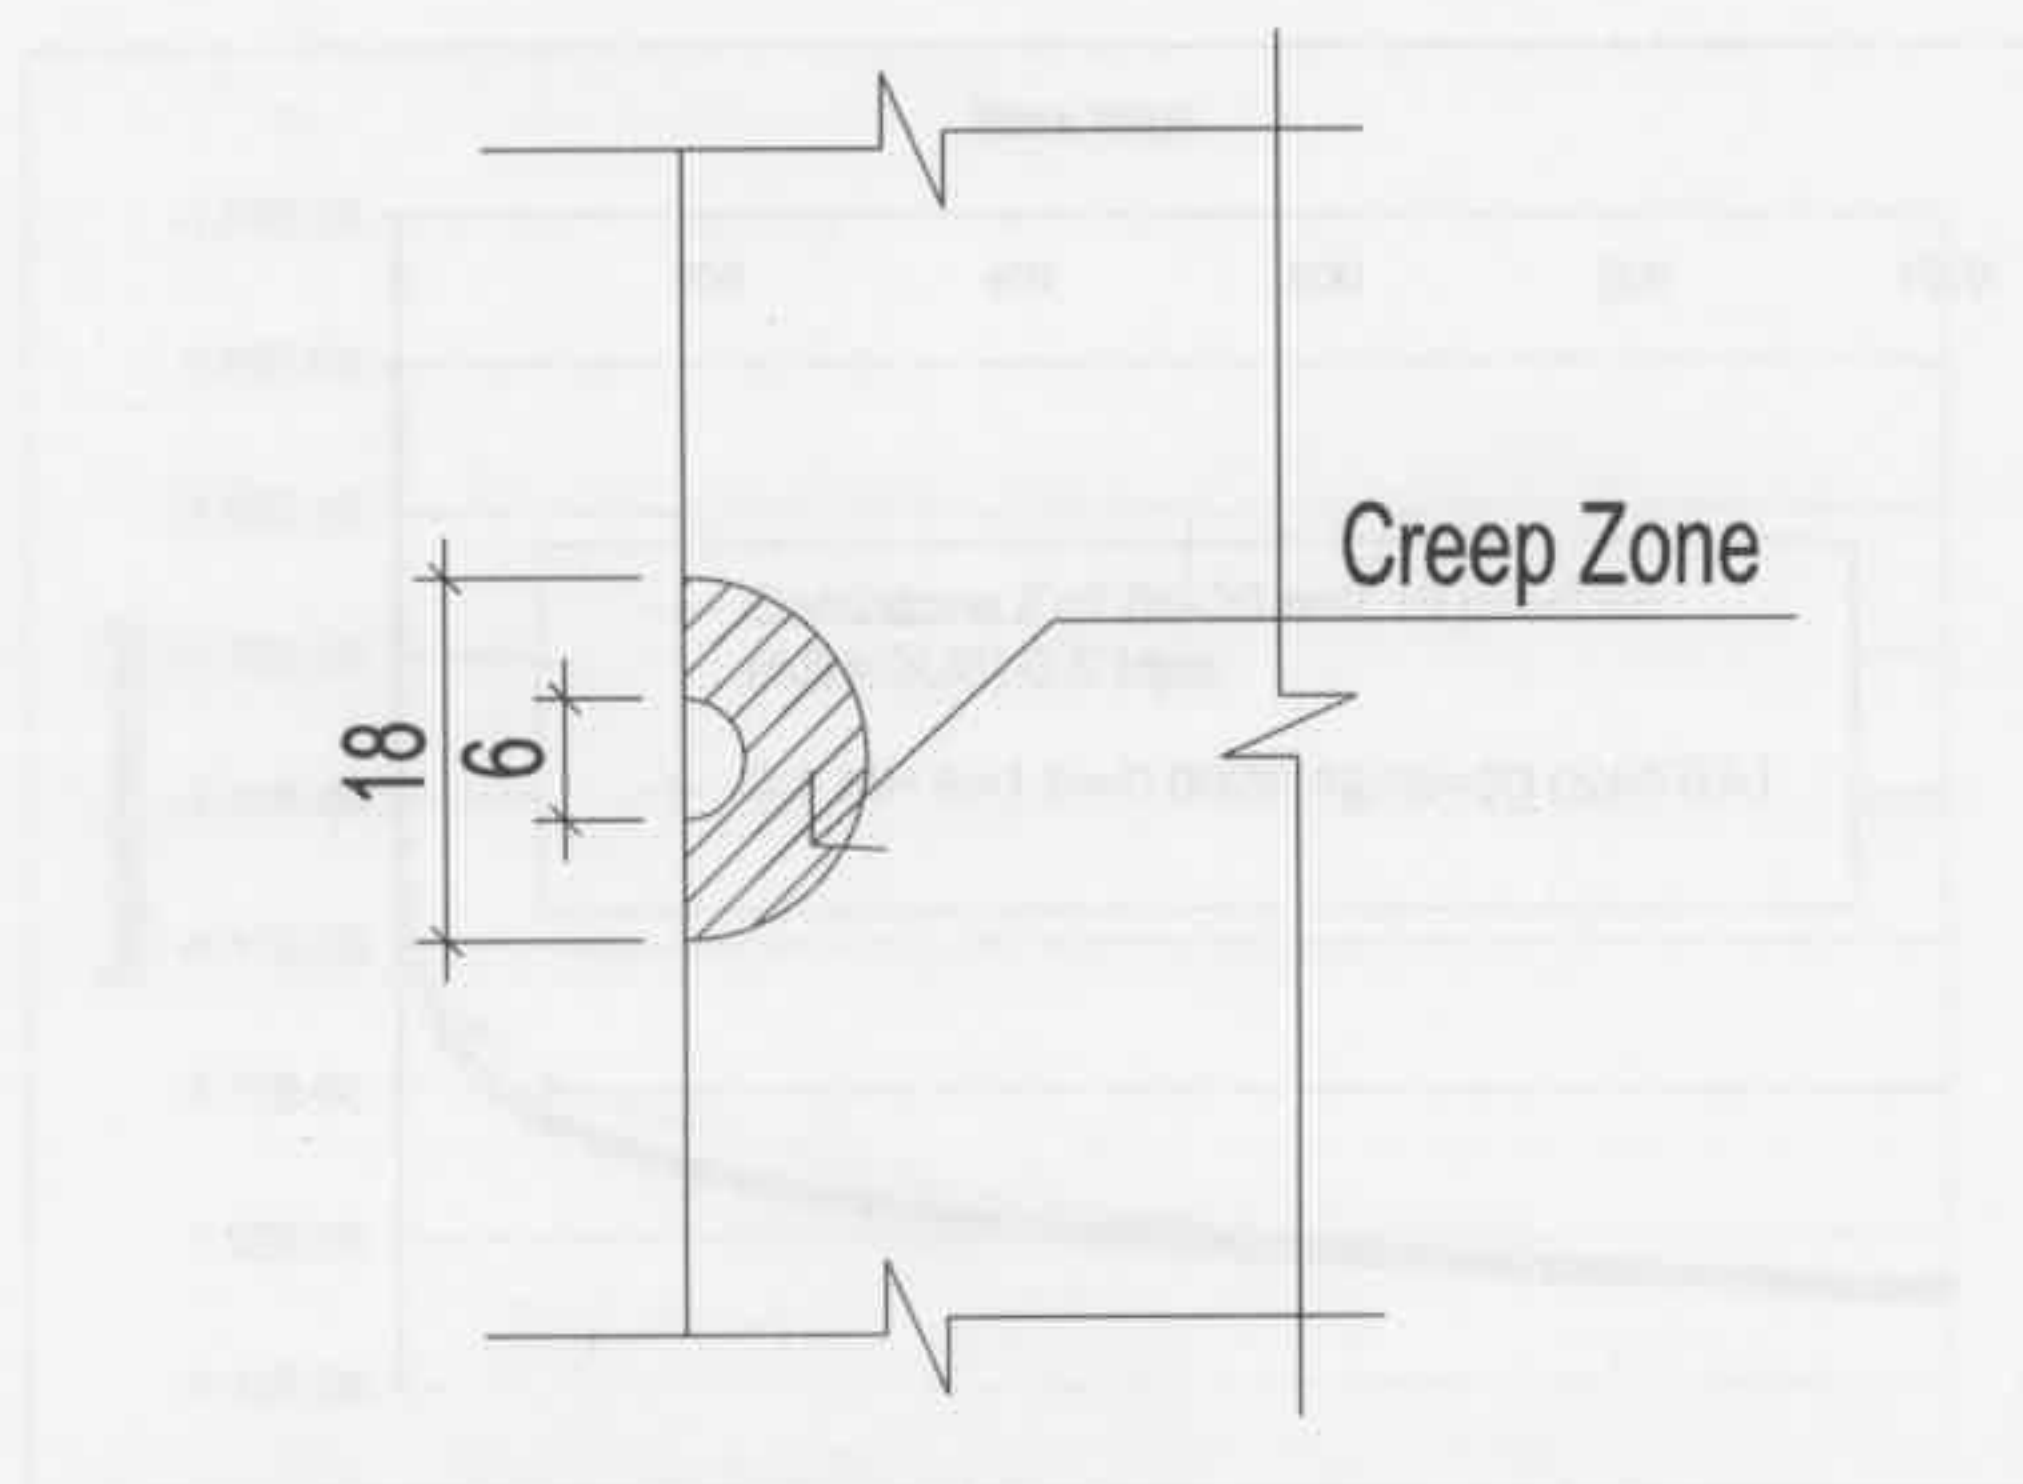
Creep Zone of circular tunnel (unit: m).
